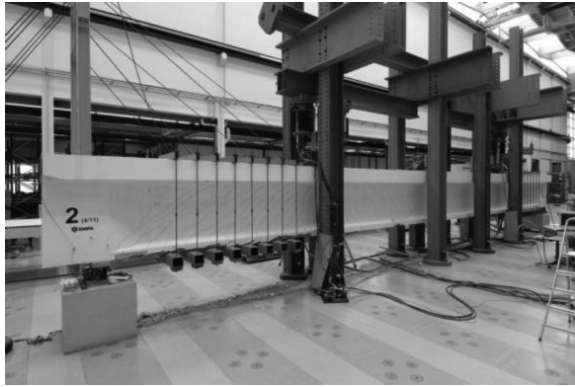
A 17 m long test girder that was strengthened and tested to failure with prestressed CFRP strips anchored with the gradient method. Note: the visible shear strengthening was not in contact with the strips. (Photo courtesy of Empa, Dübendorf, Switzerland.)
